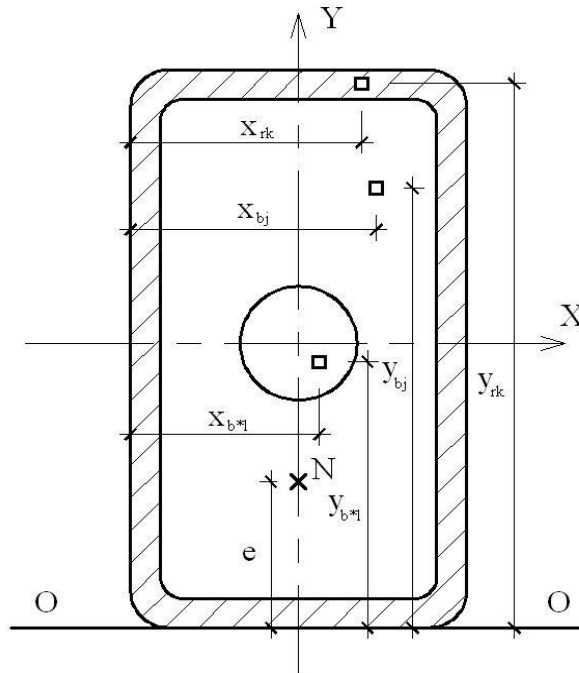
Scheme of compressed steel reinforced concrete element cross section for a shaped pipe with a cavity for engineering communications
